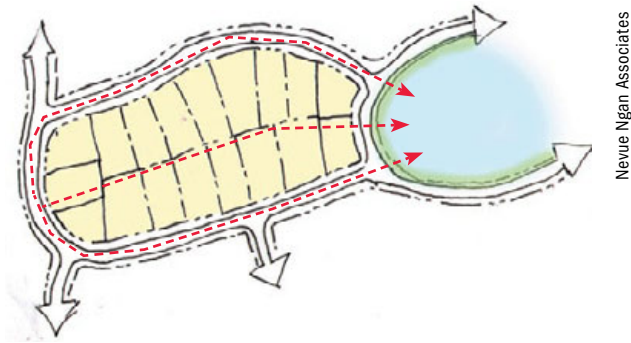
A conventional residential site plan. Stormwater is whisked away quickly via underground pipes into a large storage pond.
